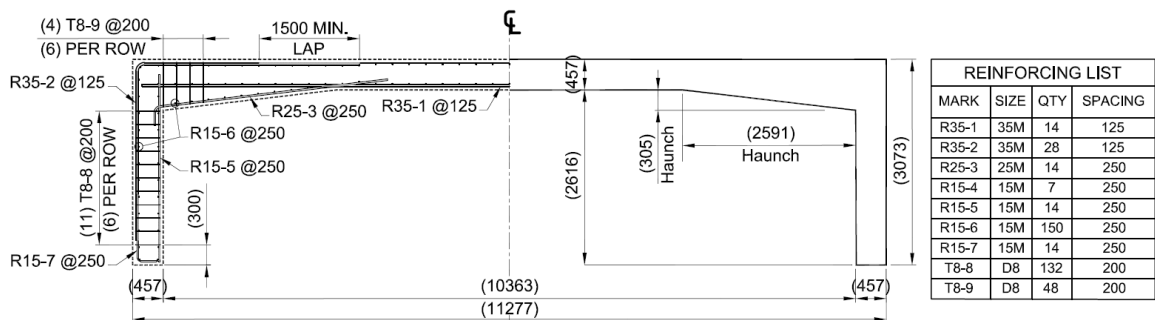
Geometry and reinforcement details of the Pickering culvert. (All dimensions are in mm)
